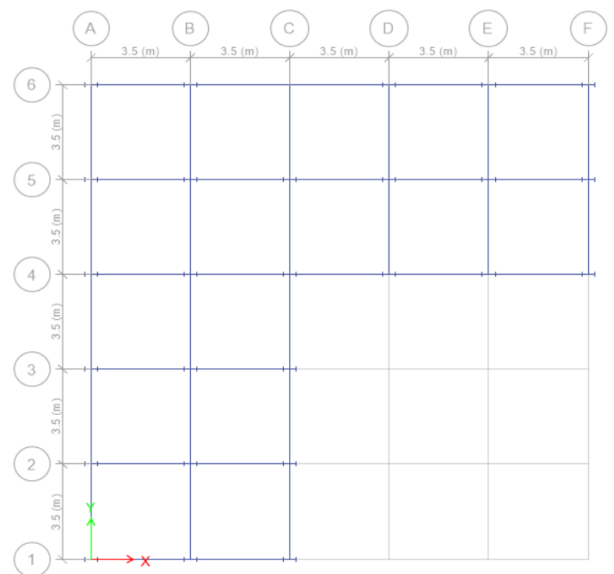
Plan View of a Three Storied L Shaped Building with External Floating Column
